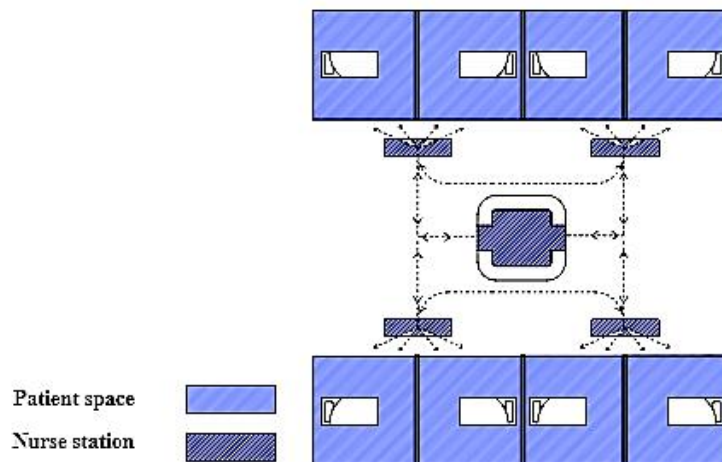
Floor plan of the hybrid *ICU* (Hamilton & Shepley, 2010, p. 17)
